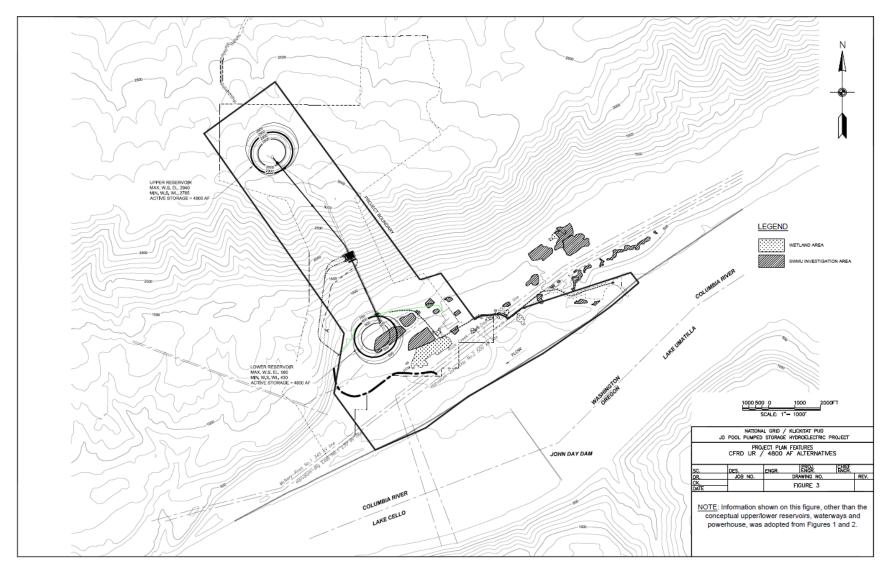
Goldendale Energy Storage Project General Arrangement—Alternative 3—Plan
